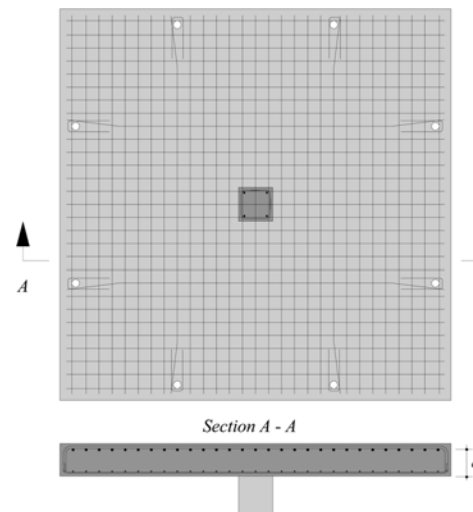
Typical layout of flexural reinforcement (details given in Table 1).
